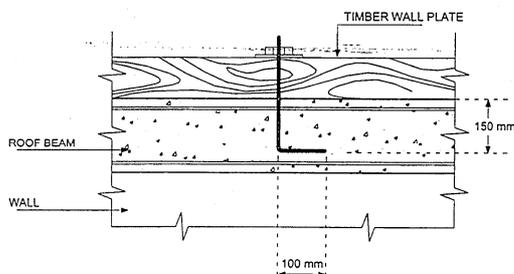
Anchoring of roof skeleton to the continuous roof beam
